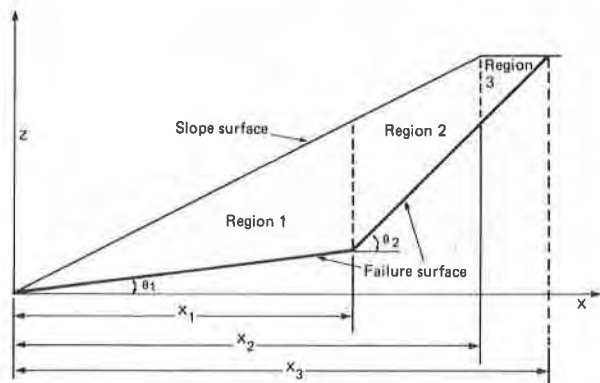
Geometry of problem when one failure surface emerges on plateau above slope
